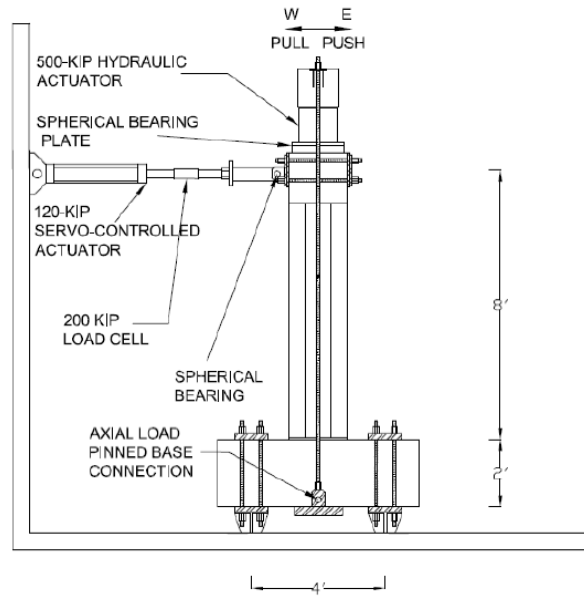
Schematic test setup for column-to-footing and column-to-cap beam connection (Pantelides, et. al, 2014)
